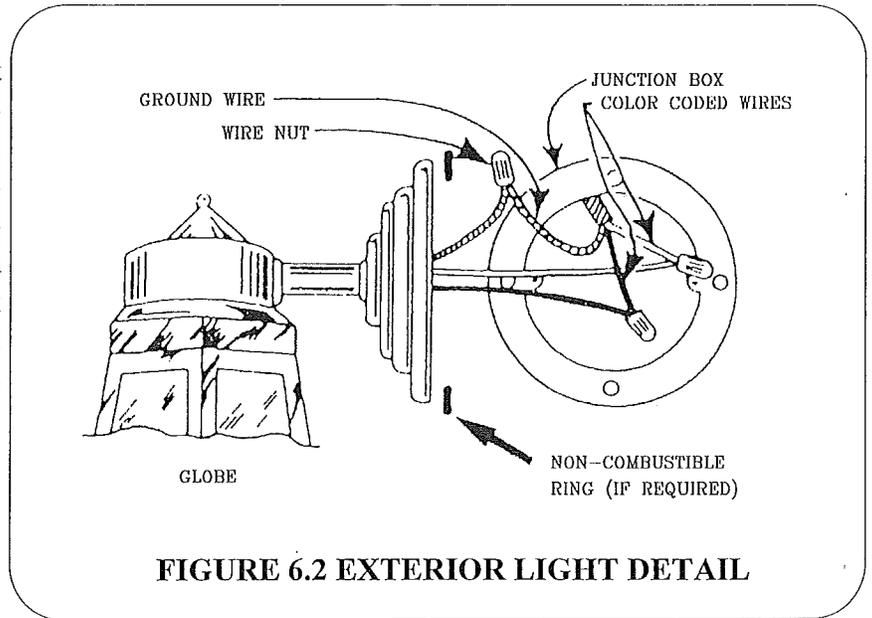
EXTERIOR LIGHT DETAIL
